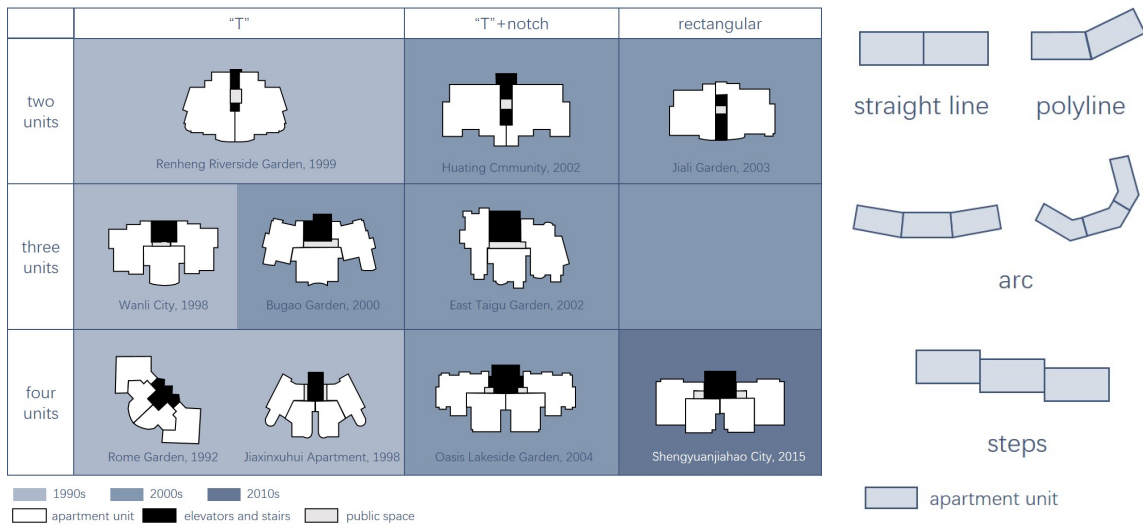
This figure shows the evolution of combined apartment building from 1980s to 2010s in Shanghai.
